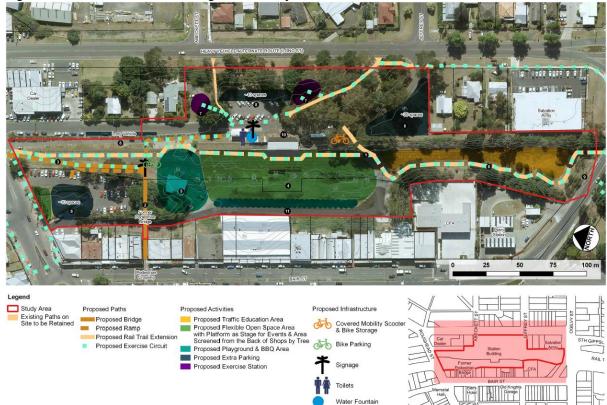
Final Master Plan Leongatha Railway Site Transformation
